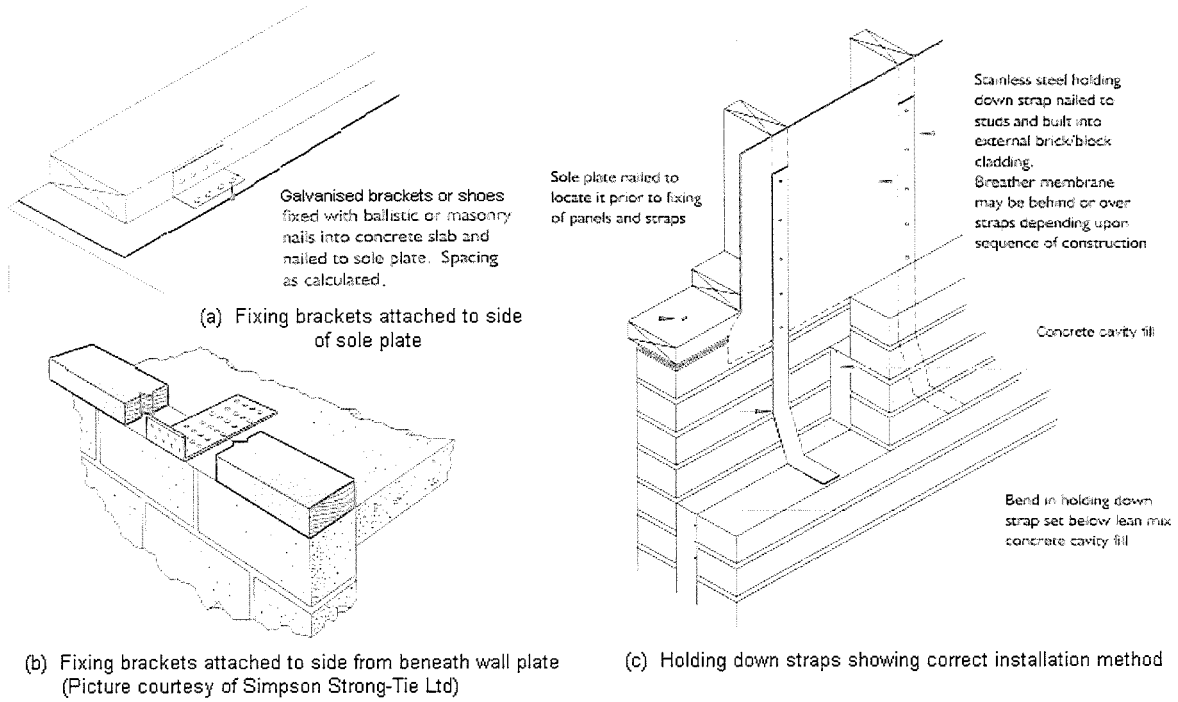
Timber frame holding down methods (IstructE, 2007)
